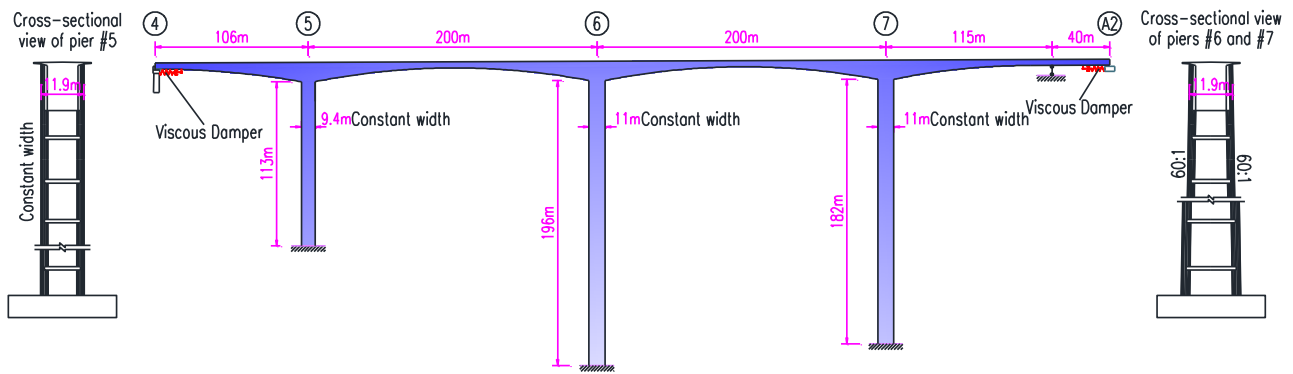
Diagram layout of seismic-resistant system (Unit: m)
